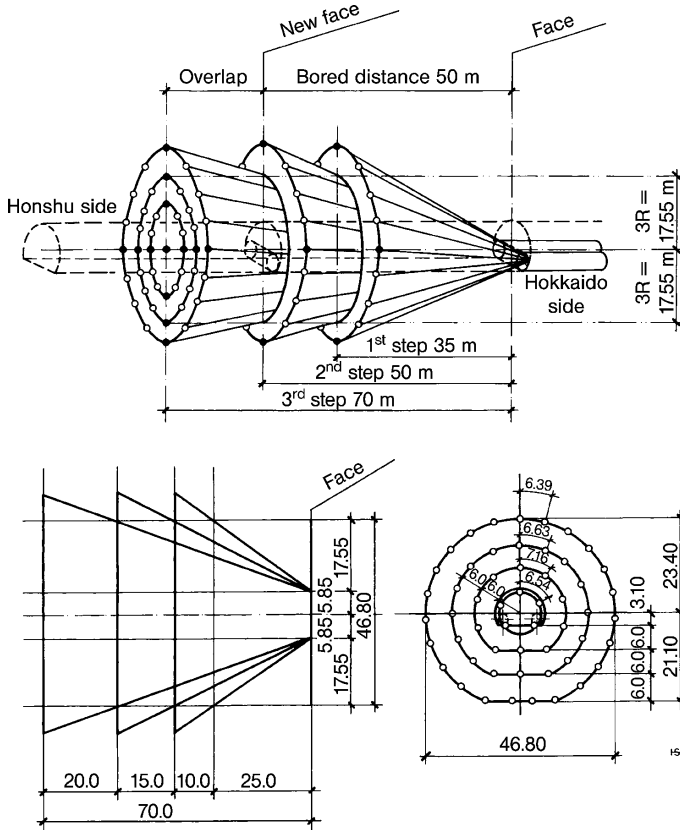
Grouting pattern in the undersea section of the Seikan Tunnel [158].
